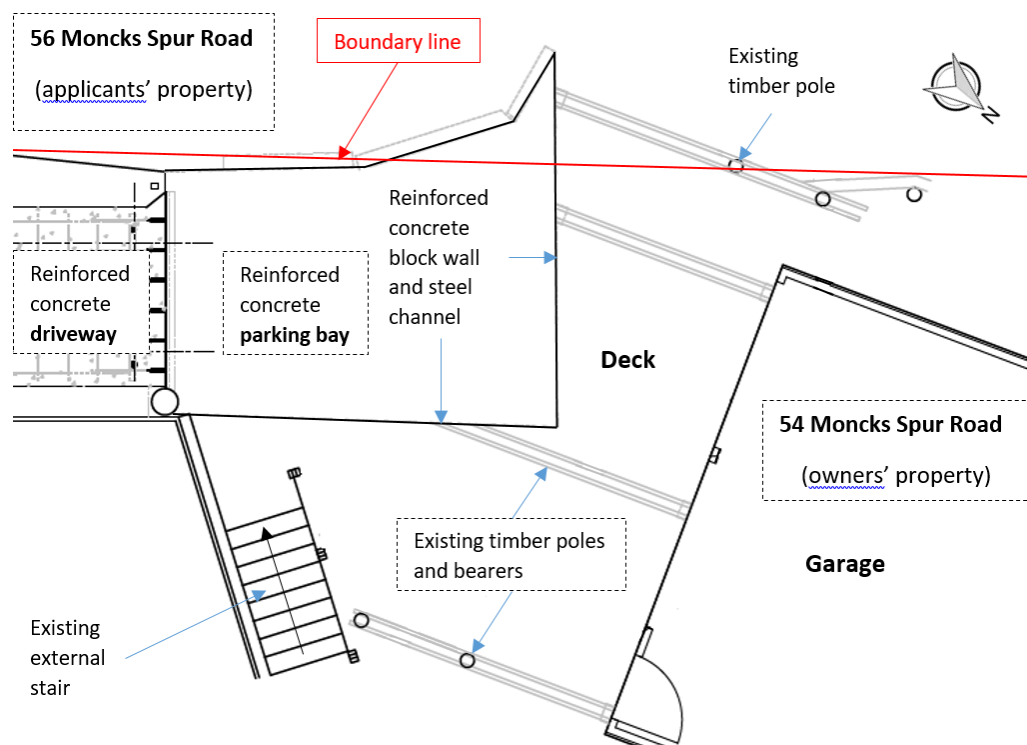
Plan of deck, driveway, parking bay and garage (not to scale)
